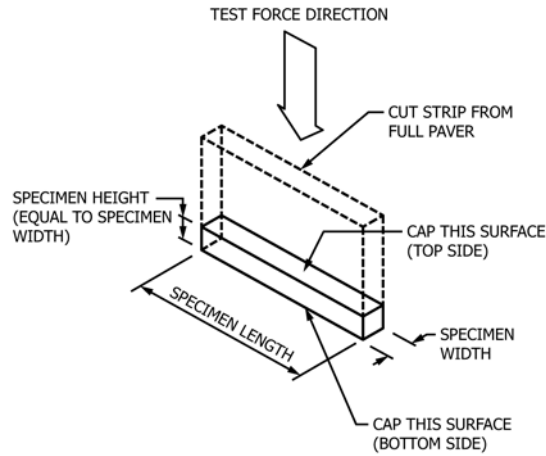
Compressive Strength Test Setup for Concrete Roof Pavers
